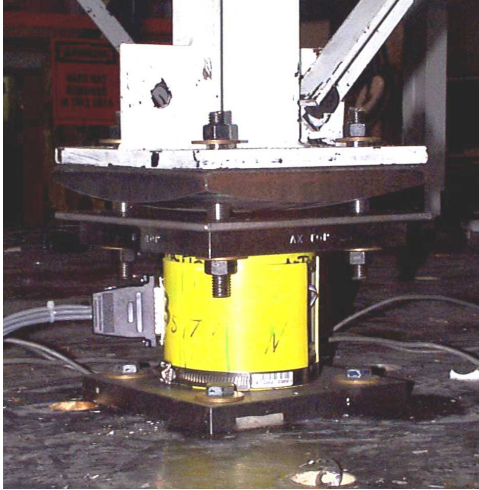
Instrumentation (Load Cell) on the First Floor Column
